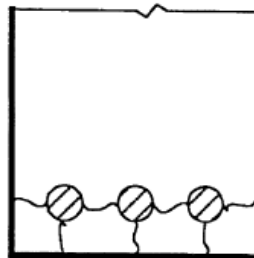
Cross sectional view of a member showing splitting cracks between bars and through the concrete cover (ACI-408R, 2003)
